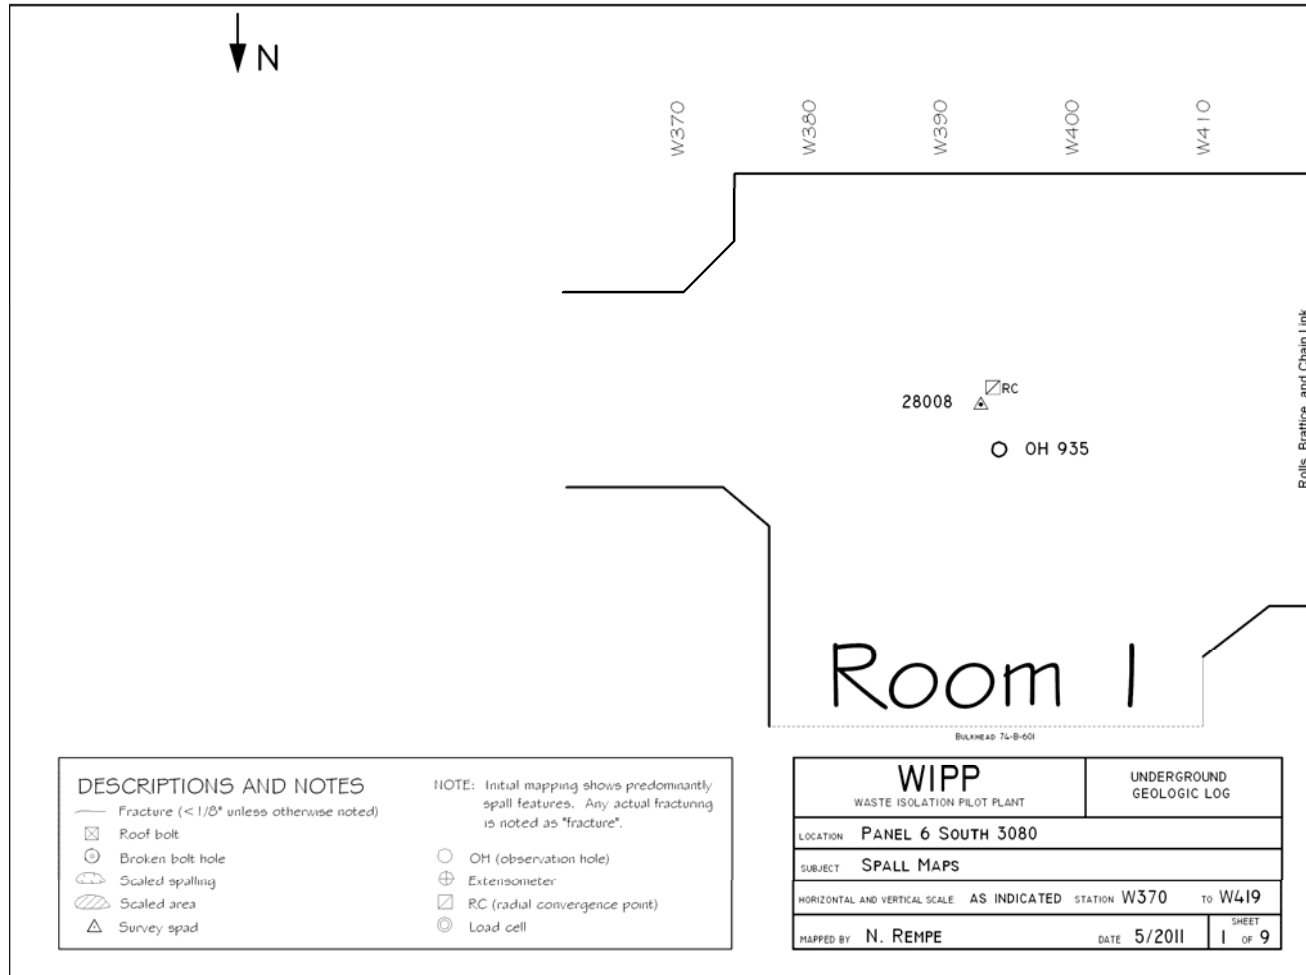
Panel 6 S3080, W390-W1210 Roof Fractures (Sheet 1 of 9)
